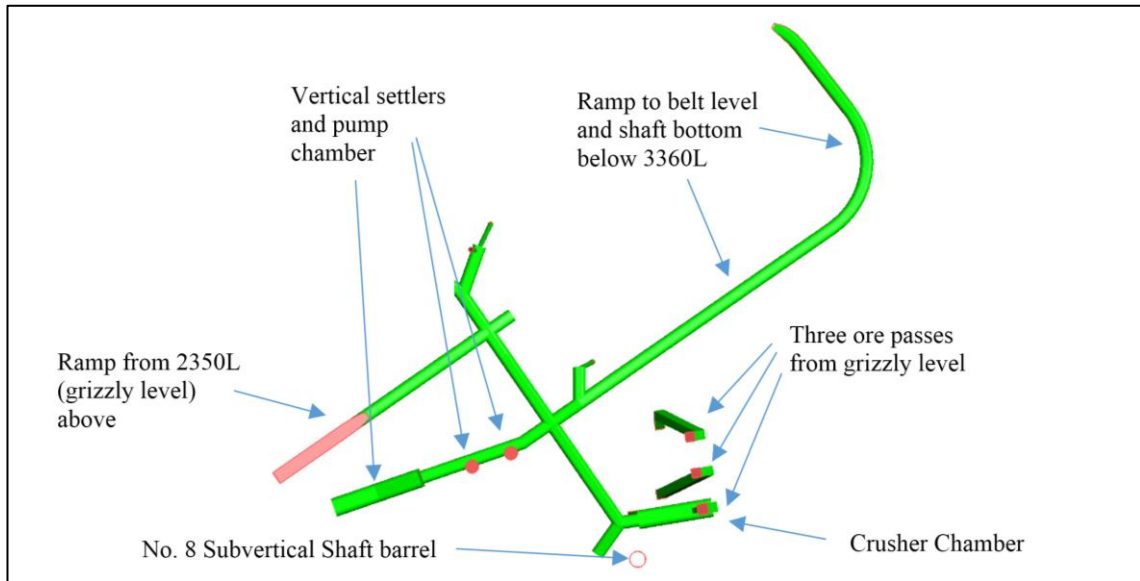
Plan view of 3360L showing the positions of the No. 8 subvertical shaft, crusher chamber, pump/settler chambers and shaft access ramps
